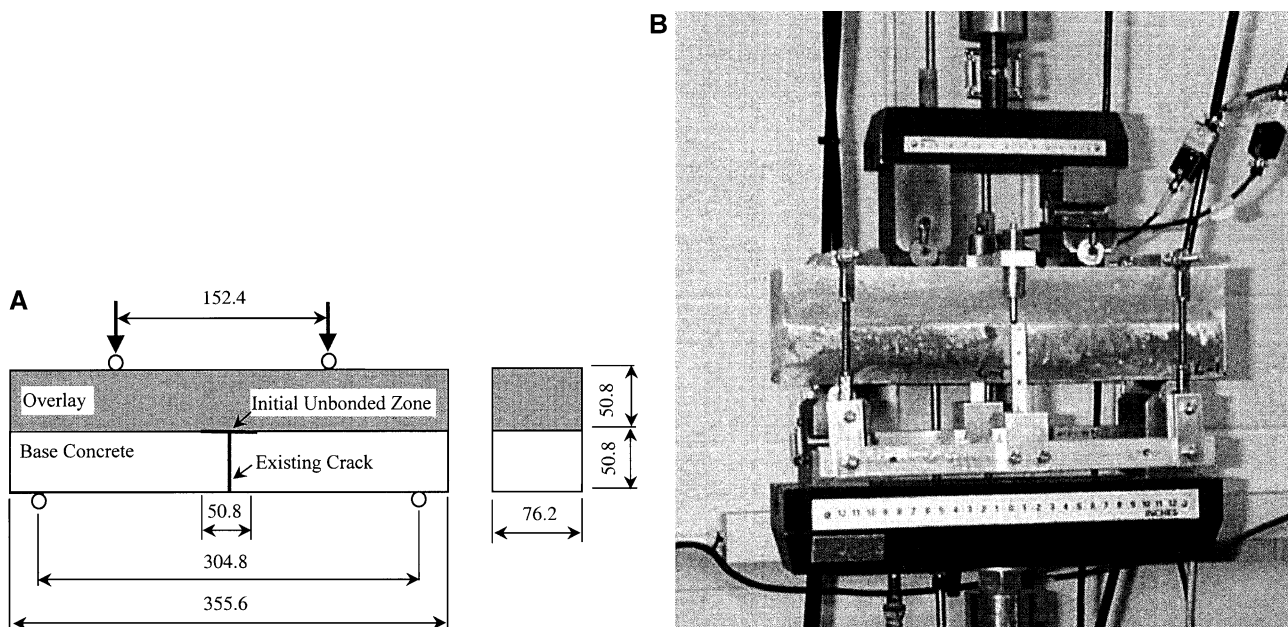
(A) Dimension of composite beam and loading configuration in bending (mm) and (B) test set-up.
